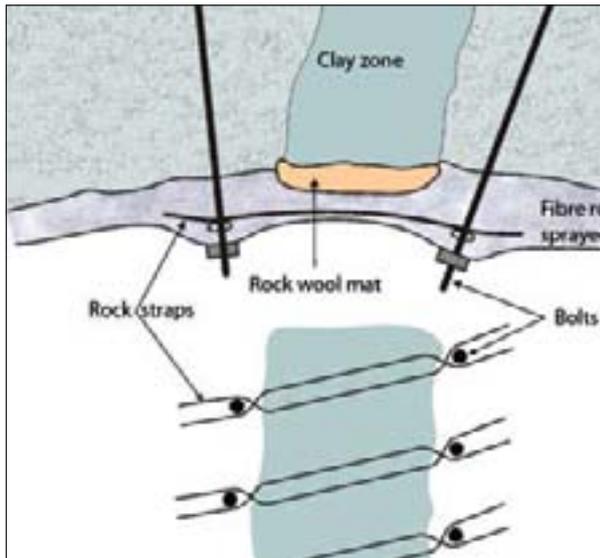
Example of the use of a fender in the supported clay zones section and plane
